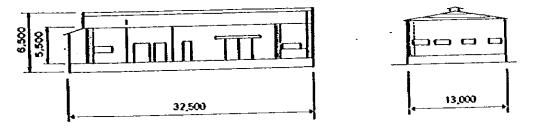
General Arrangement Plan of Fish Market and Ice Manufacturing Facilities
